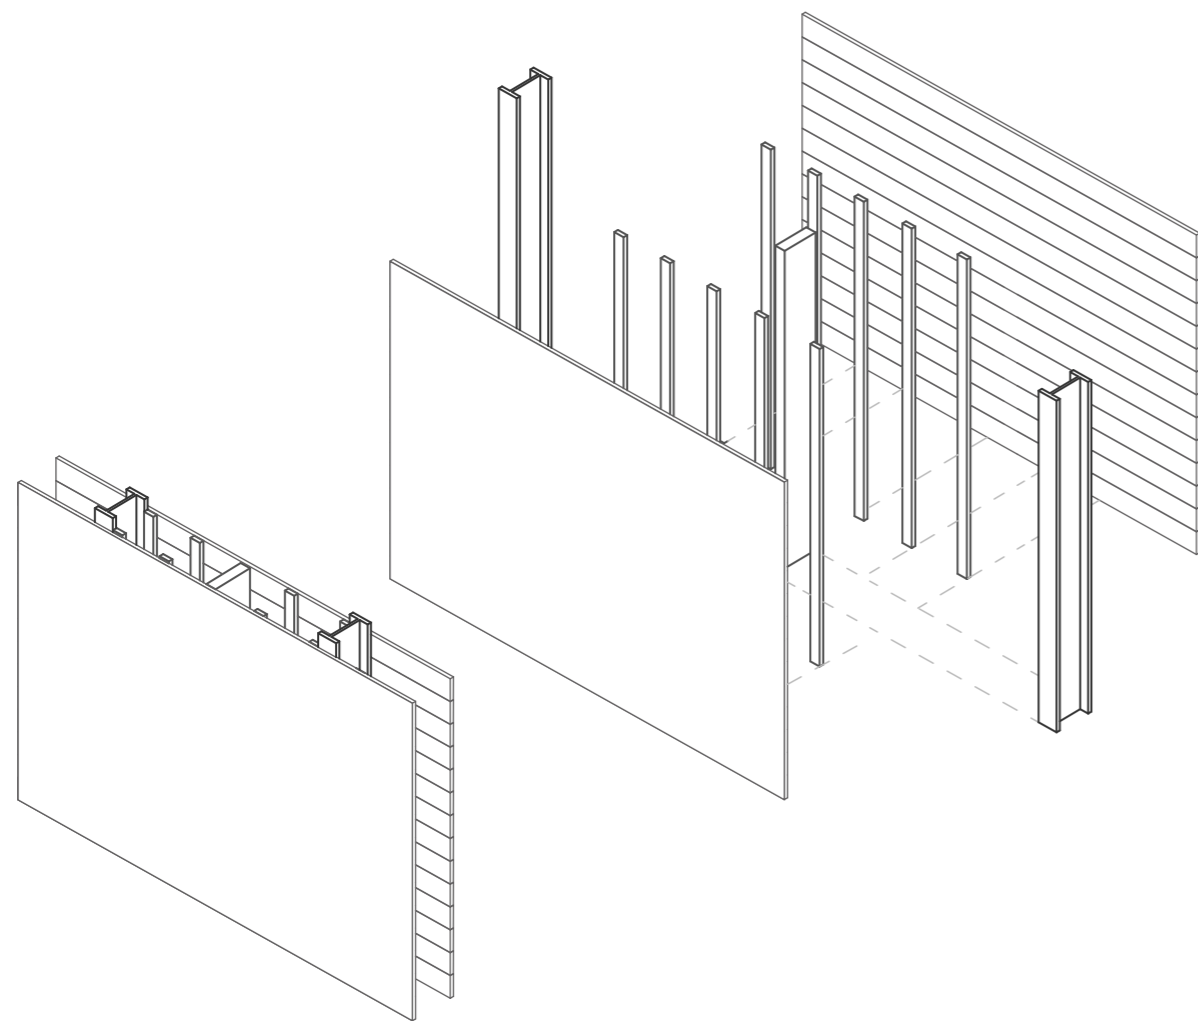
Axonometric drawing of partition wall. Scale 1:50
